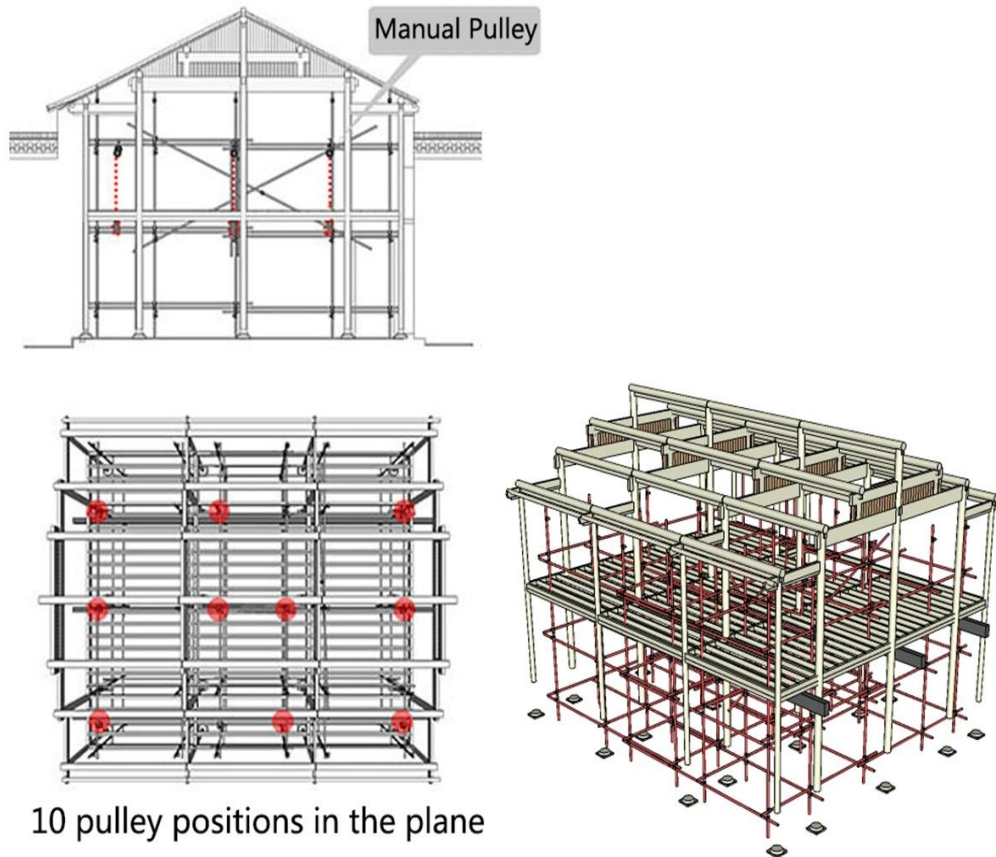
Roof trusses and wood floor is a whole, after upgrading the pillars off the ground (images by author).
